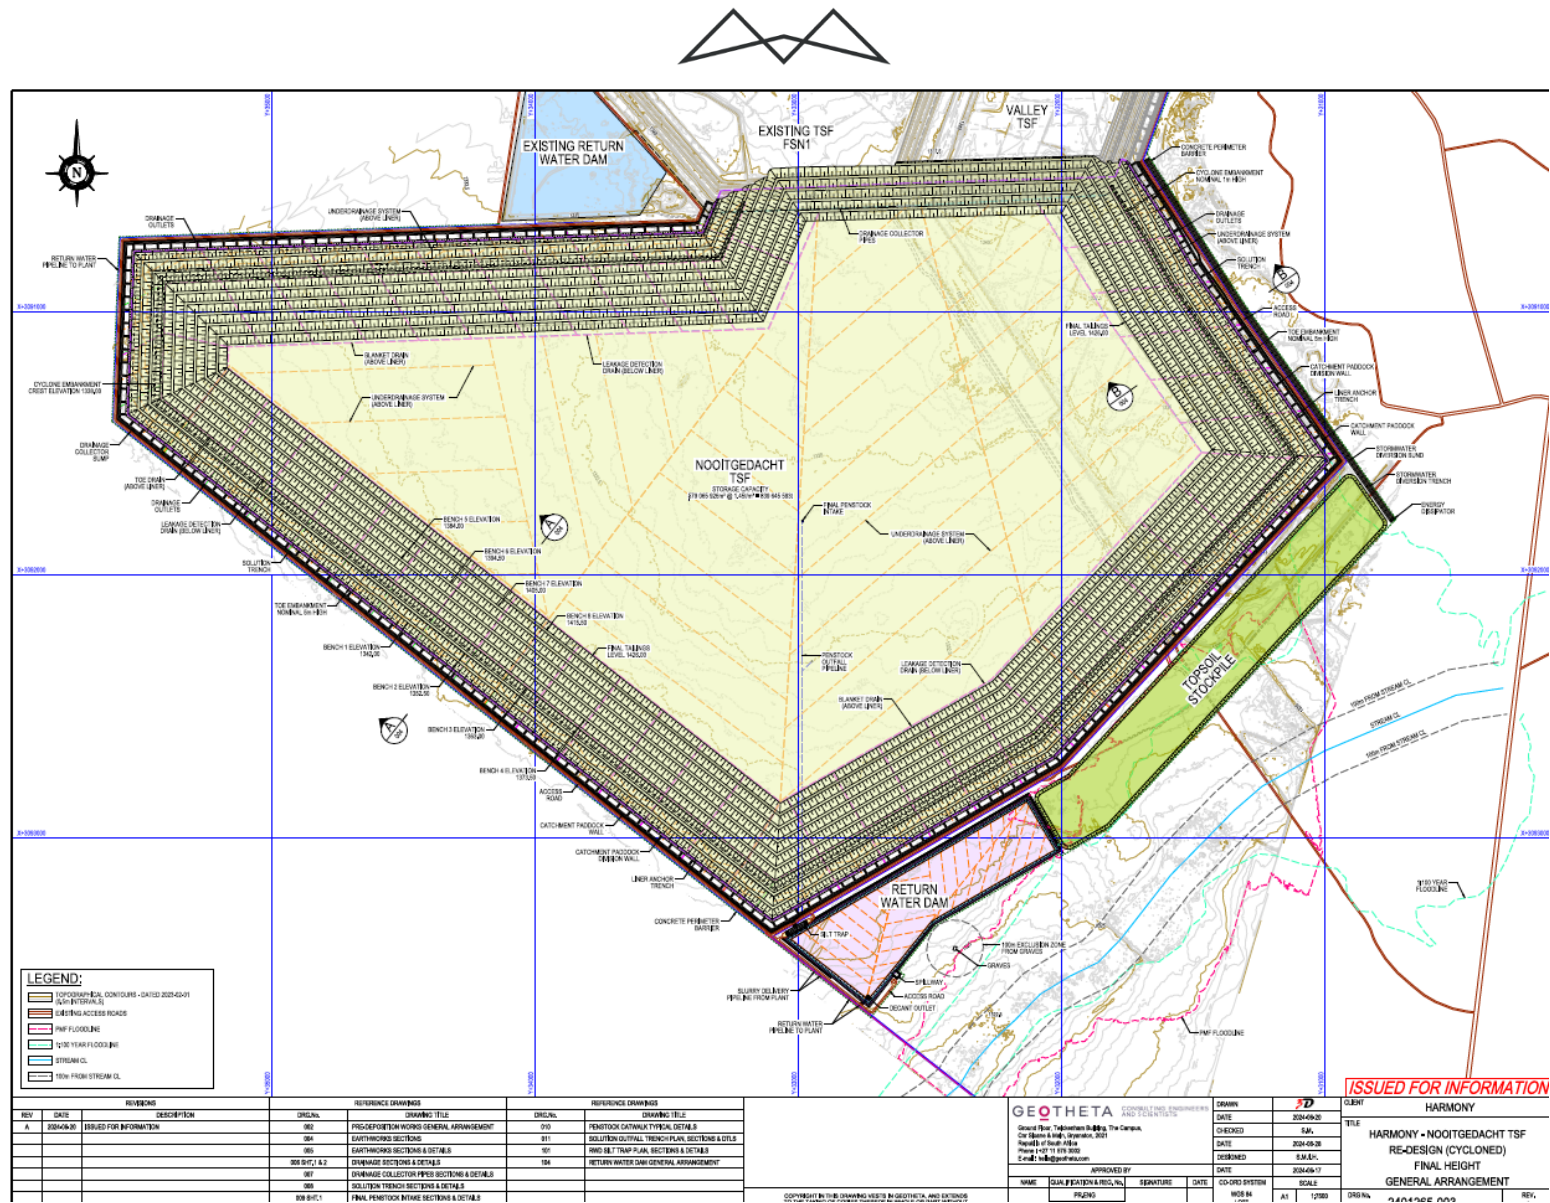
Preliminary general arrangement of the proposed Nooitgedacht TSF
